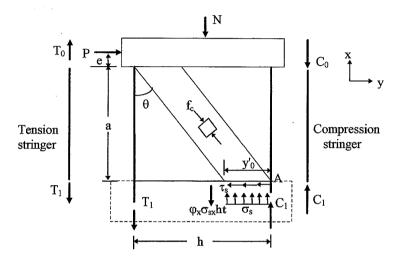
Shear wall with longitudinal reinforcement in the web loaded by transverse as well as normal forces
